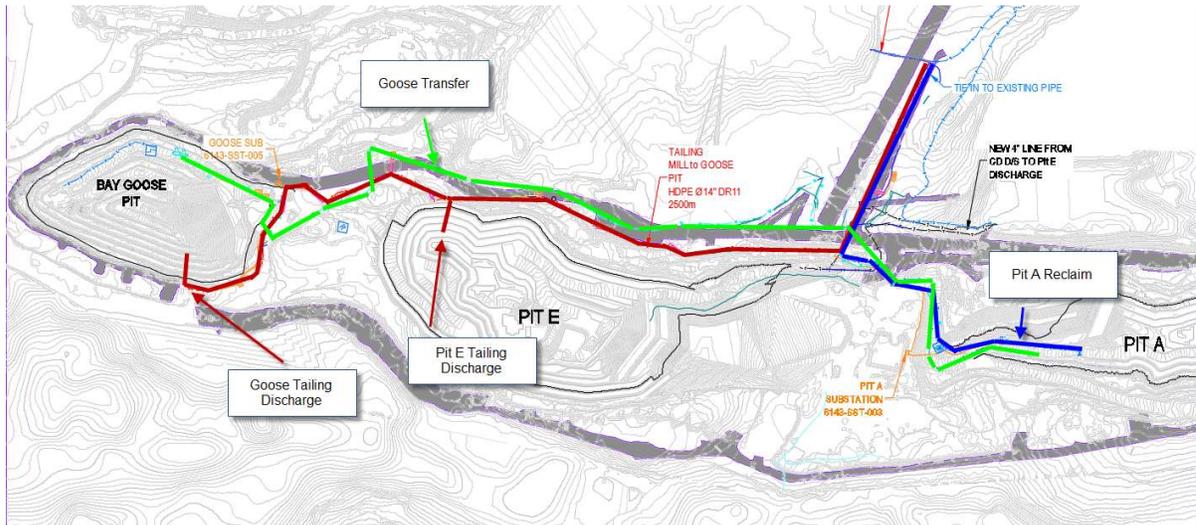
Plan view of In-Pit Area and Related Infrastructure (as of Fall 2020)
